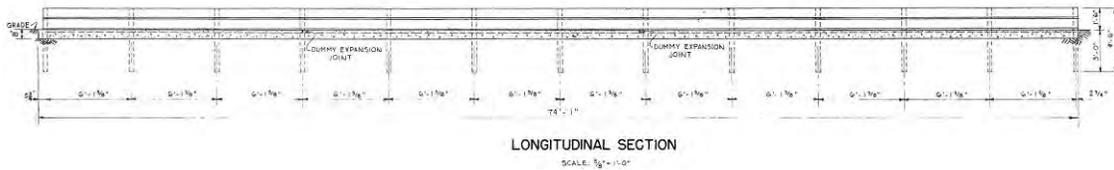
C-124 concrete mock-up for air movement training longitudinal section, 1951 (standard drawing 2-13-60 sheet 1; C-124 mock-up for air movement training, concrete plan, sections, and details; 7 December 1951). (NARA College Park, RG 111-SC WWII, box 241, photo SC413207).
